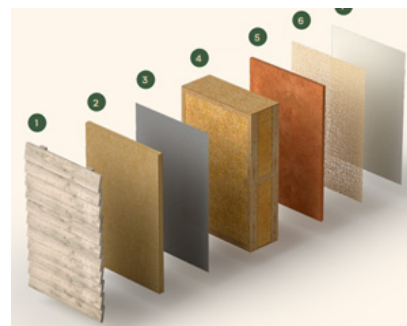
Timber frame construction. Source: <https://www.westerveld-nederlof.nl> <https://www.houtbouwelementen.nl>
